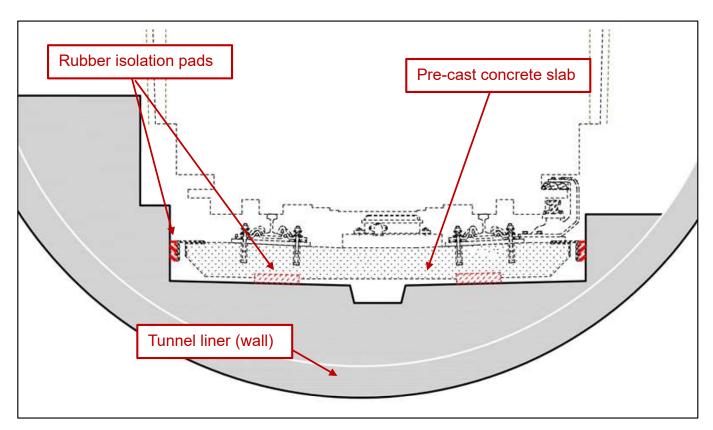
Cross-Section of TTC Floating Slab Track
